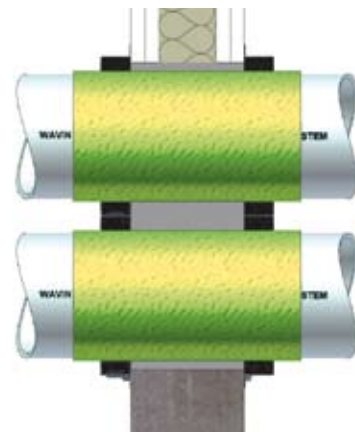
BM-90 fire collar: sealing of adjacently installed wall pipes
